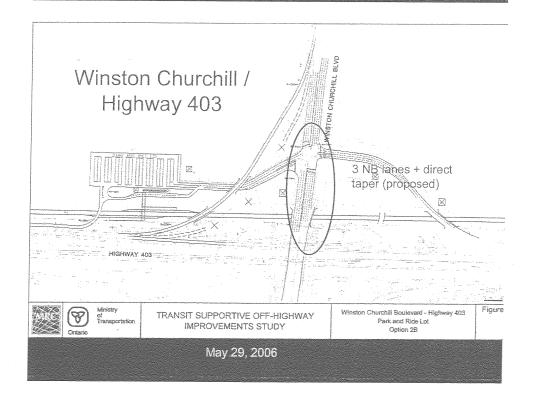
Utility Relocation Plan and intersection layout—Winston Churchill Boulevard
